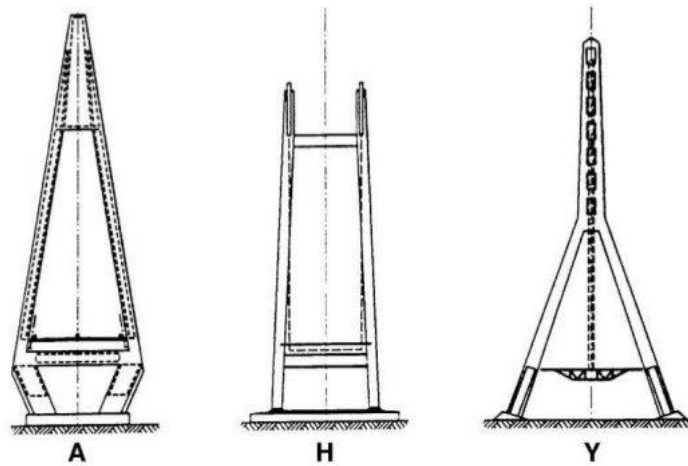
CABLE-STAYED TOWER CONFIGURATIONS
